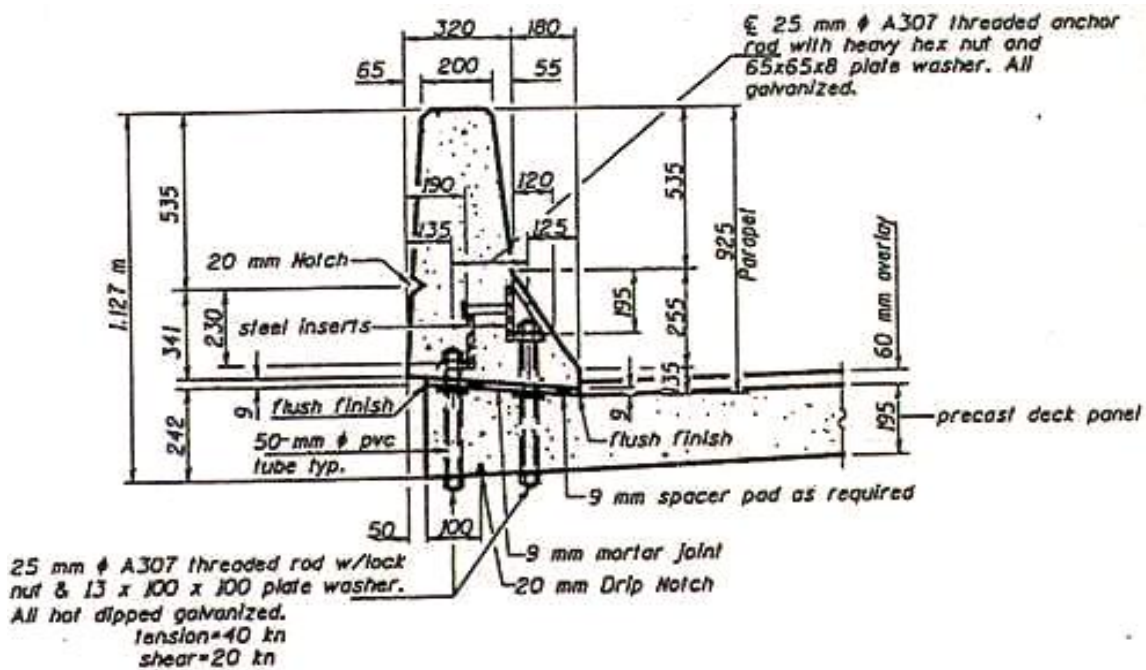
Detail of a precast panel and a barrier connection
